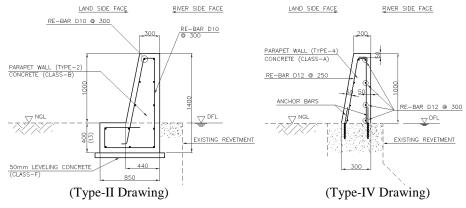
Cross Sections of Reinforced Concrete Floodwall based on Design Calculation
